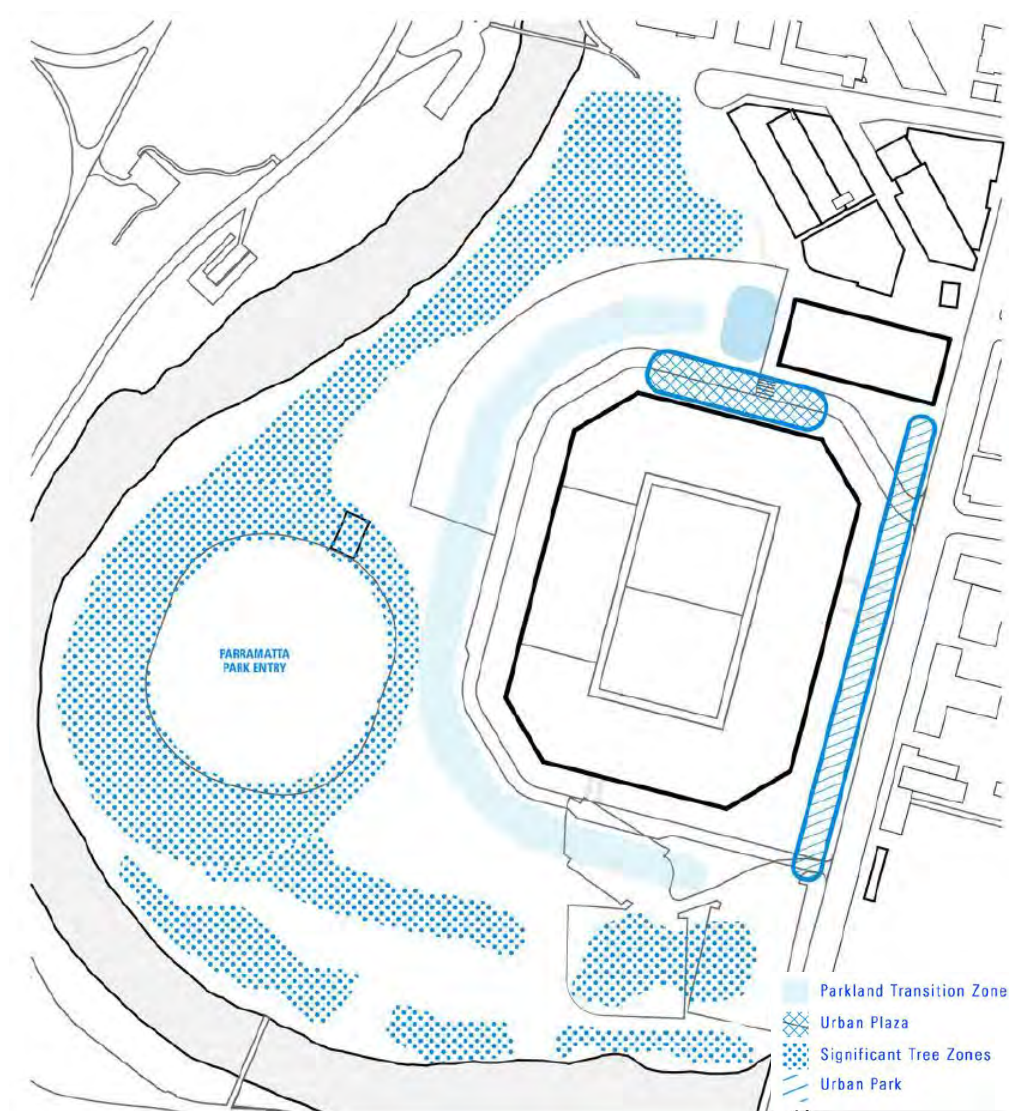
Western Sydney Stadium Concept Proposal– Landscape Plan
